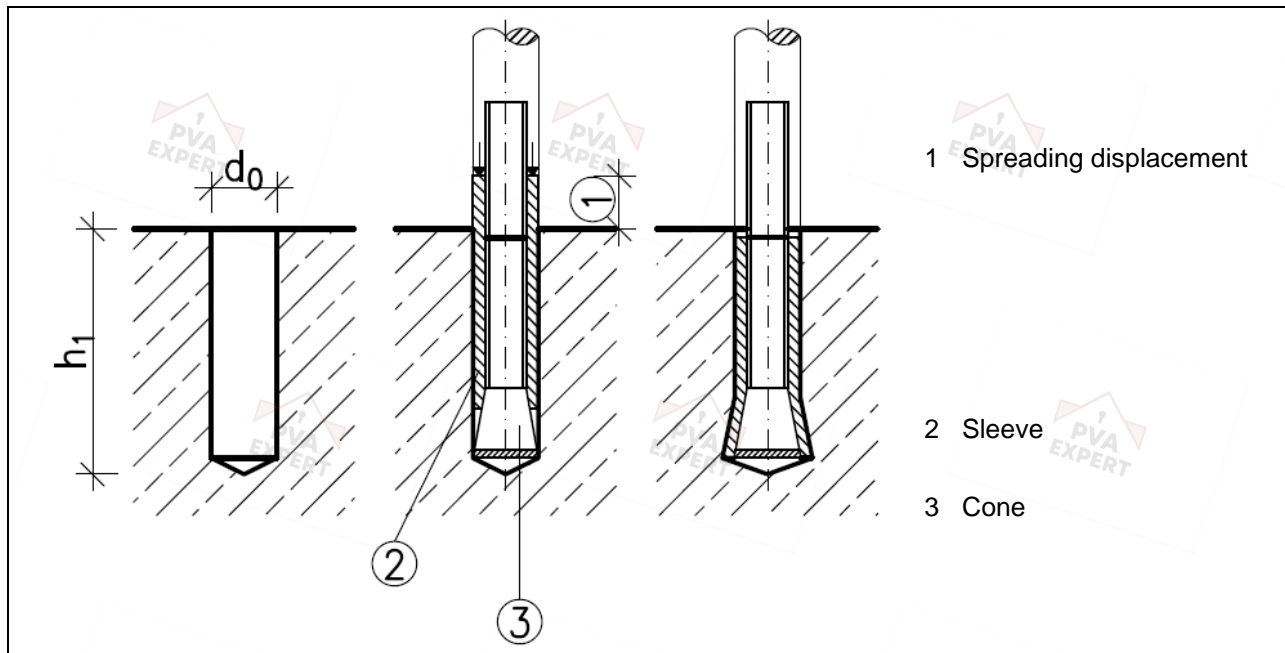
Fastener installation by hammering the sleeve over the cone; e.g., by using a drilling machine
